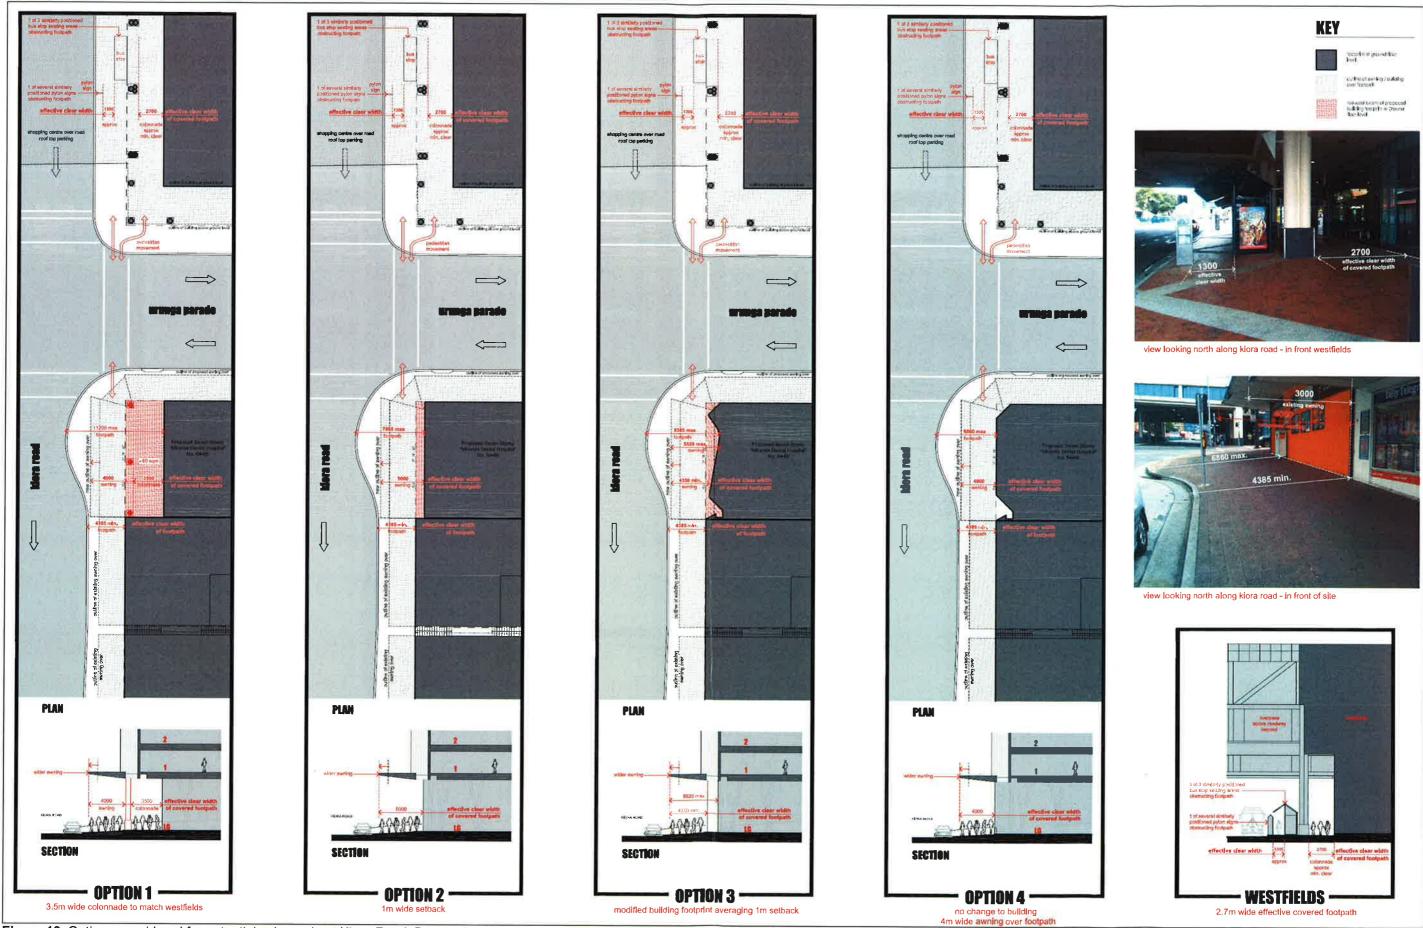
Options considered for potential colonnade at Kiora Road. Proposal is seeking partial implementation Option 4 (3 metre wide awning). Department recommends full implementation of Option 4 (4 metre wide awning) (Source: PPR).
